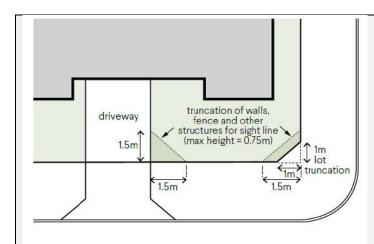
Truncation at street corner to provide sightlines (refer A3.8.7).
